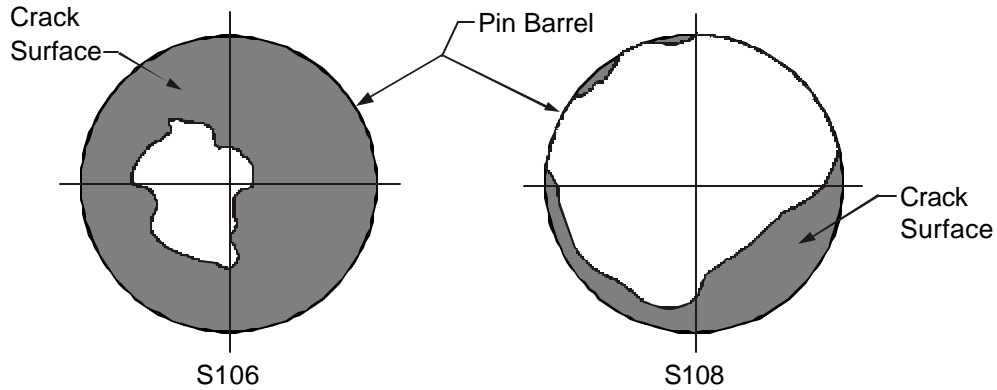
Cracked section results from immersion tank ultrasonic inspection.
